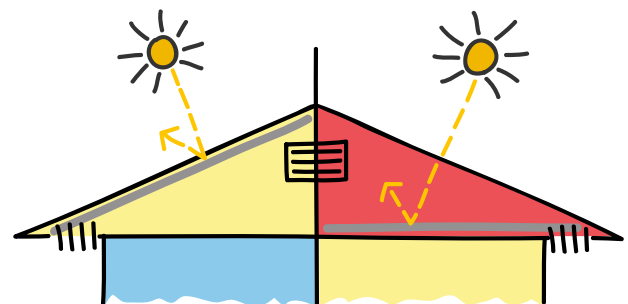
Reflective foil under the roof sheeting keeps the roof-space cooler than if placed on the ceiling.
